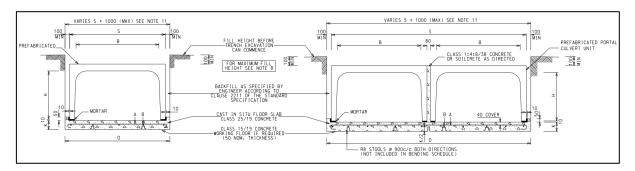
Proposed typical designs for single portal (left) and multiple portal (right) box culverts. Source: AURECON (2020).
